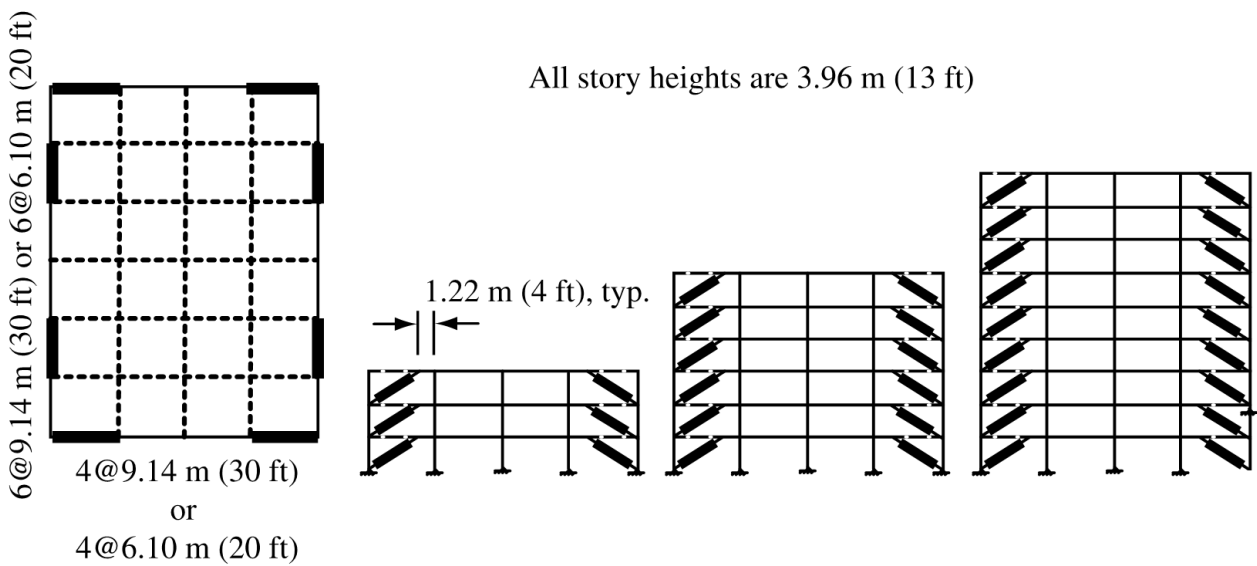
Building plan and elevation views of the analytical model - Prinz et al. (2012)
